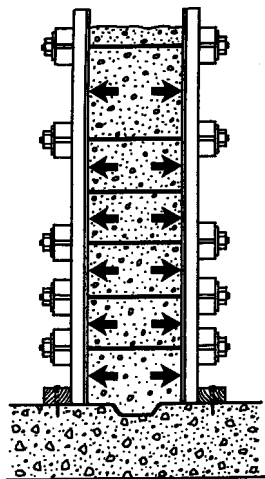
Pressure of Concrete on Vertical and Battered Formwork
